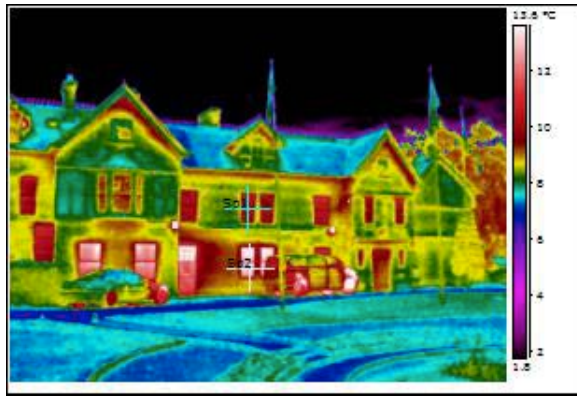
West elevation. The windows at ground floor are significantly warmer than the windows at first floor, as the secondary glazing is installed for windows at the first floor.
